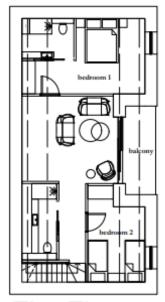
Proposed Site Plan (Ground Floor) (not to scale)
